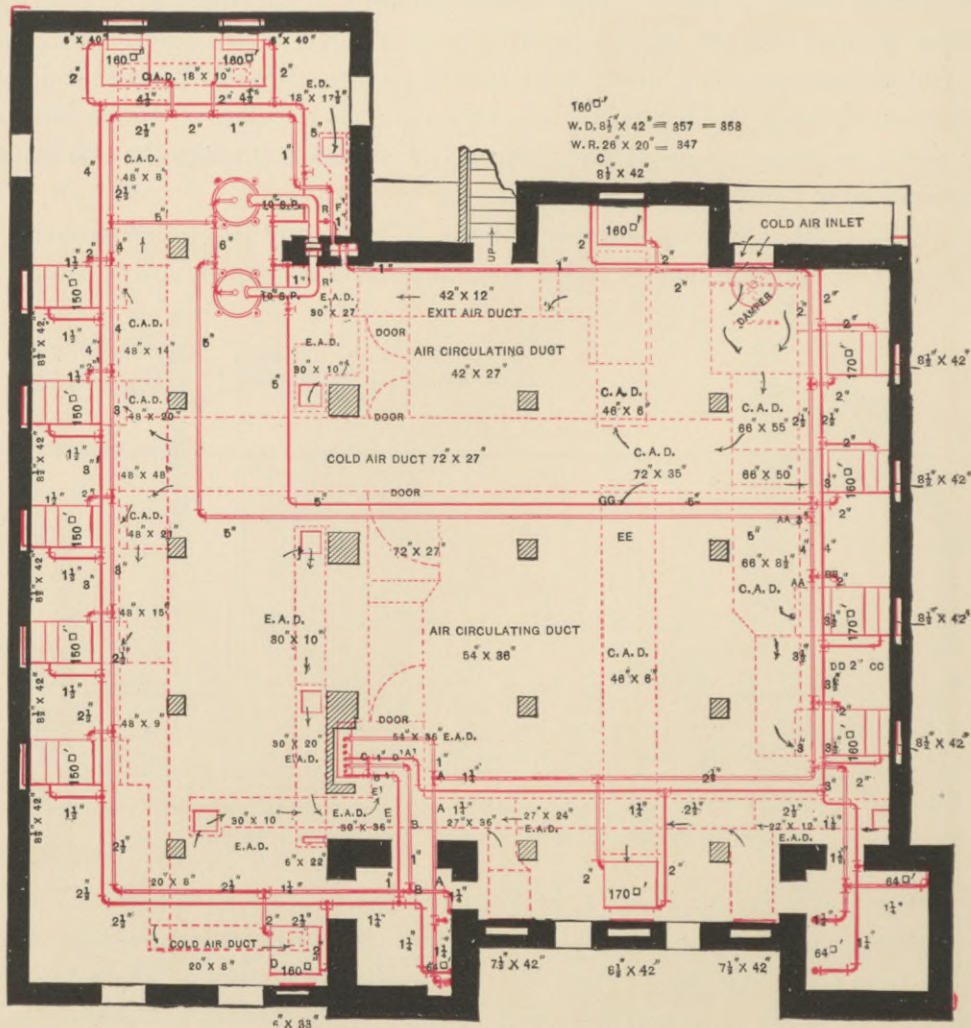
Basement Plan. Scale  $\frac{1}{8}$  inch to the foot.
